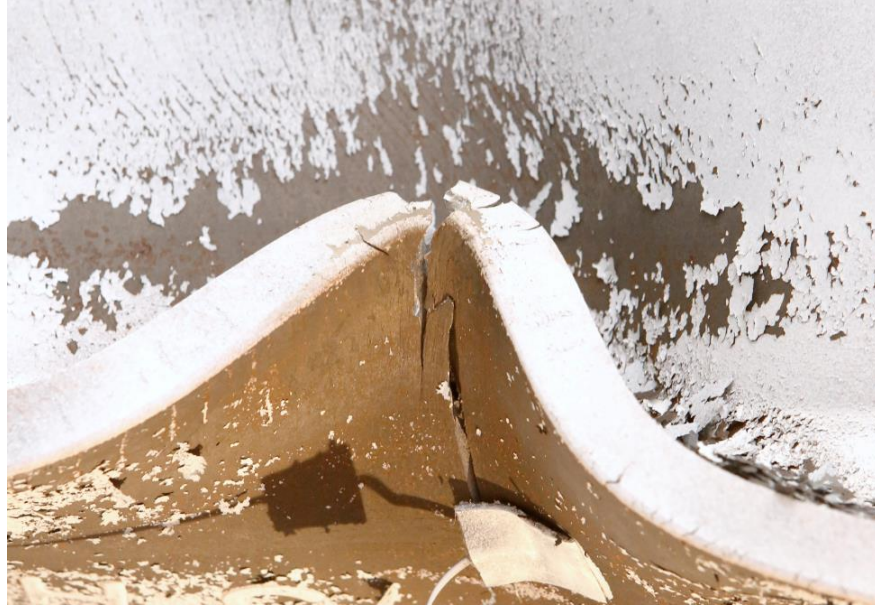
Specimen C4: Beam Bottom Flange Fracture after one cycle at 0.06 rad
